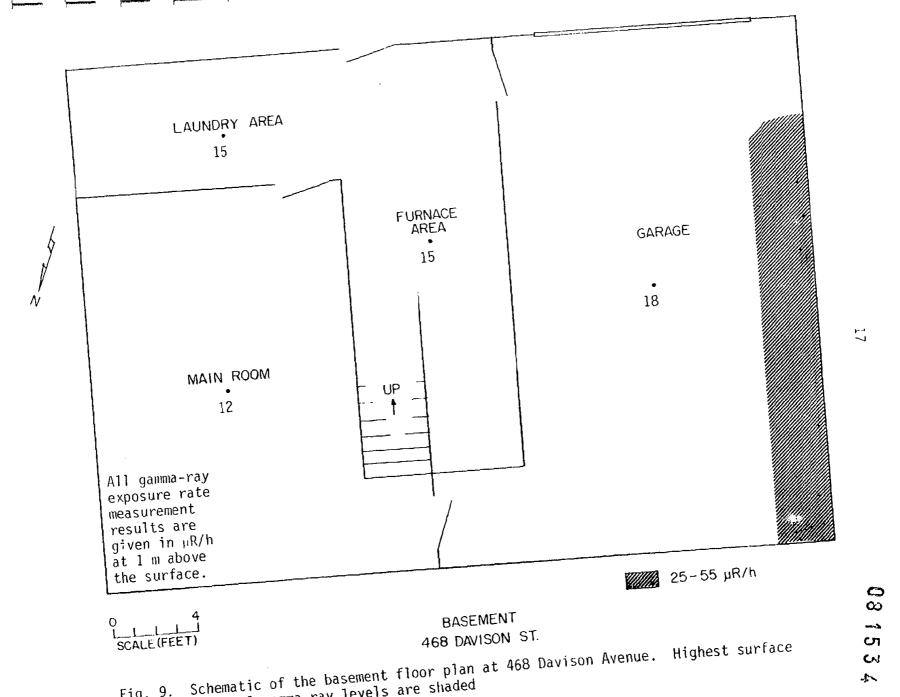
Schematic of the basement floor plan at 468 Davison Avenue. Highest surface external gamma-ray levels are shaded
